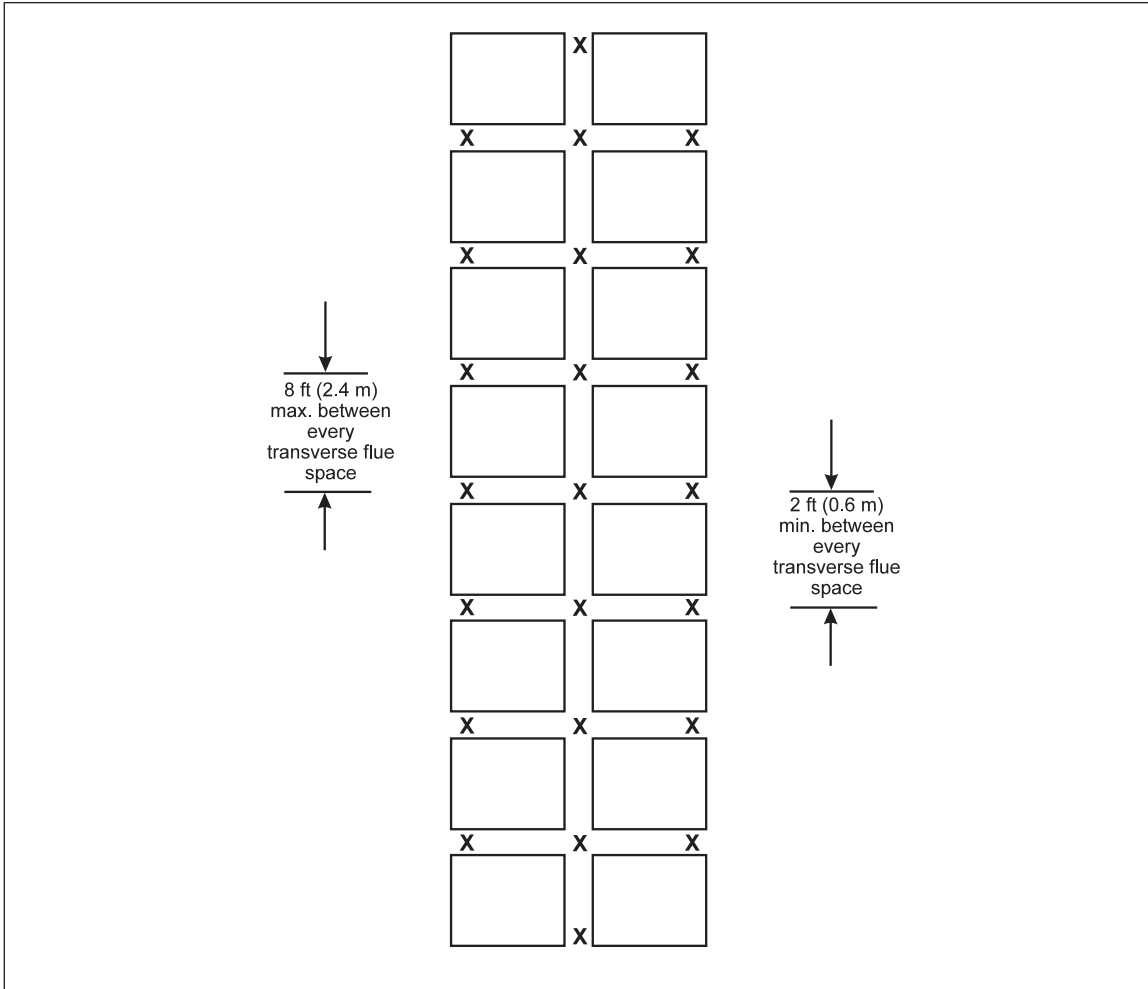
Plan view of IRAS(E) in-rack sprinkler arrangement for double-row racks
